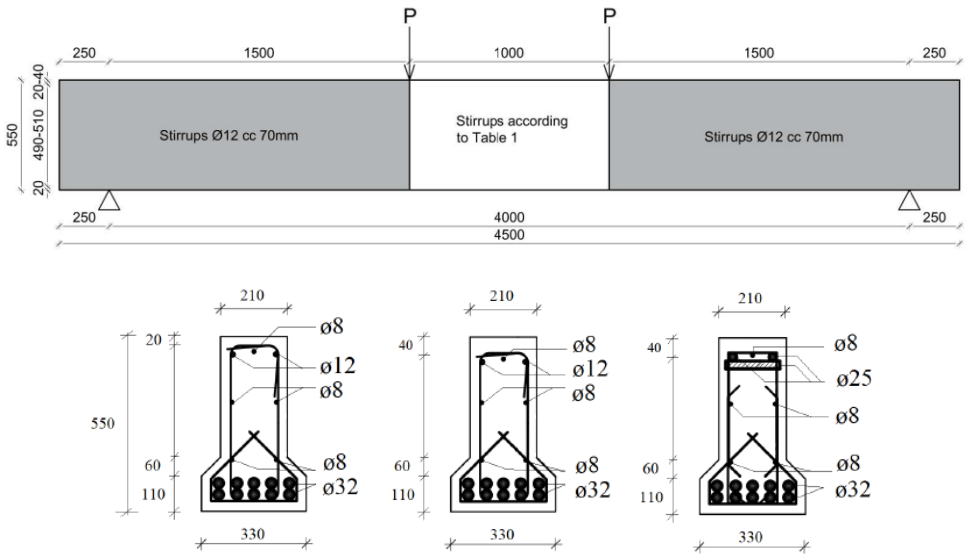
Beam geometry and reinforcement layouts between the loading points. Dimensions are in [mm].
